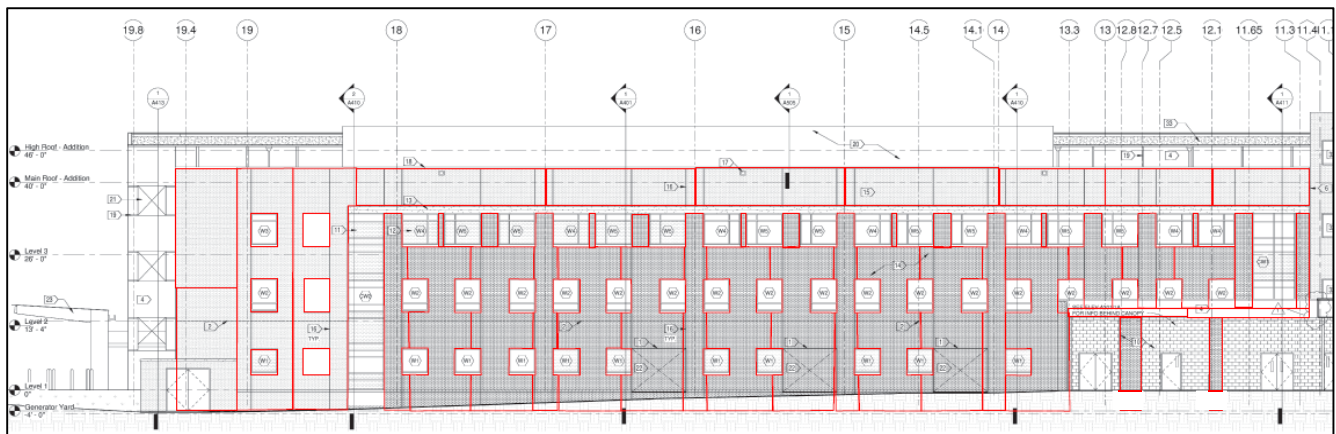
, East Elevation - It can be seen that a combination of horizontal and vertical panels are used.
